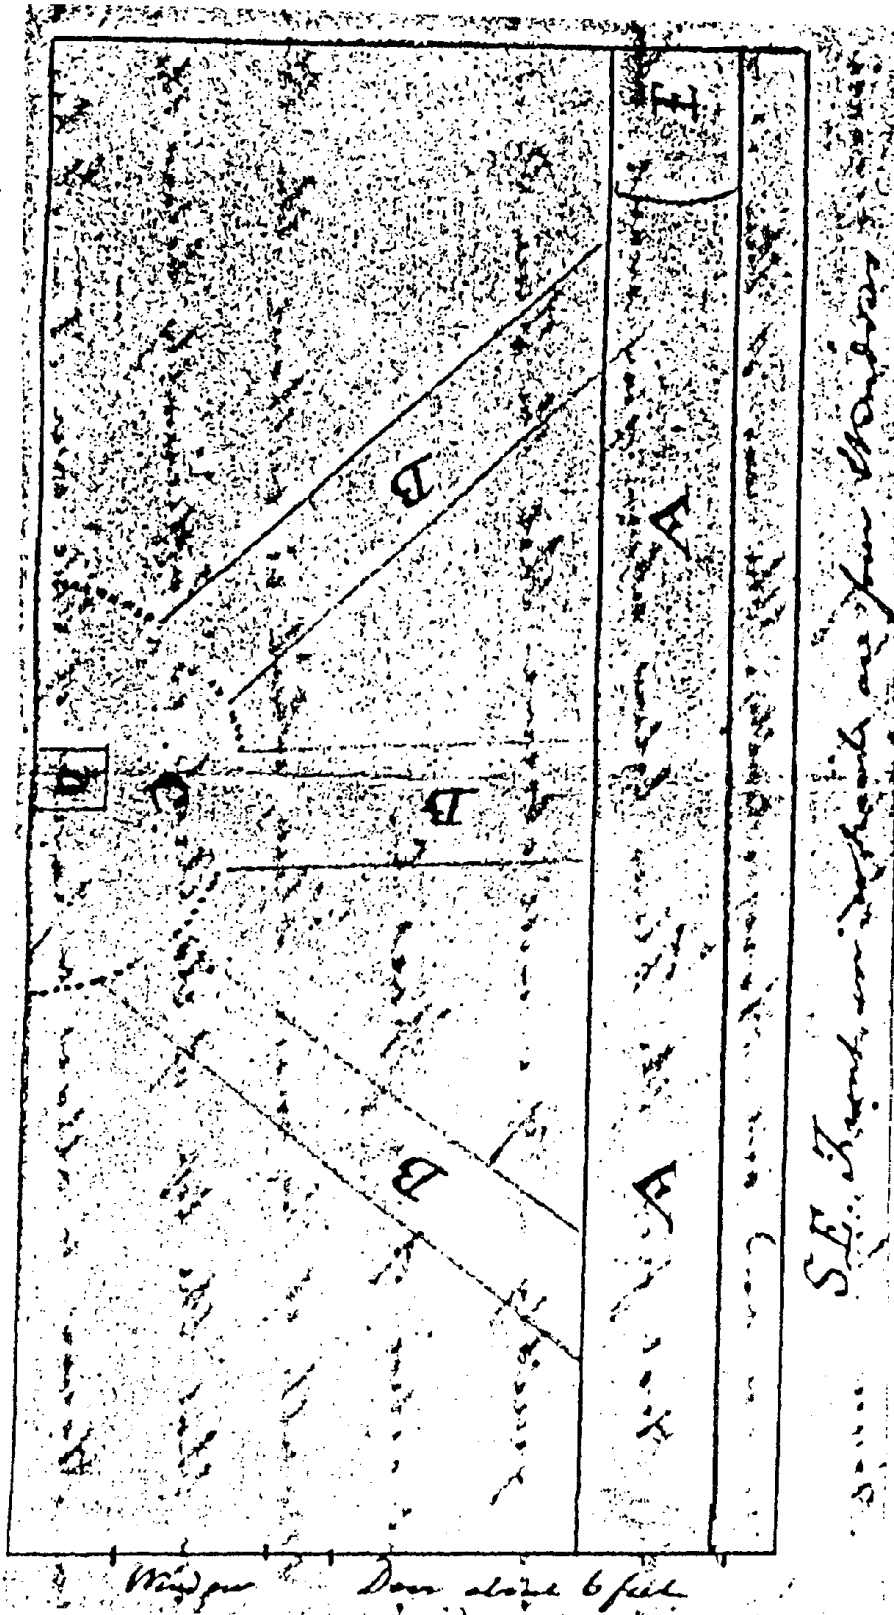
Plan of the Mount Clare Greenhouse by Tench Tilghman (1784) –
